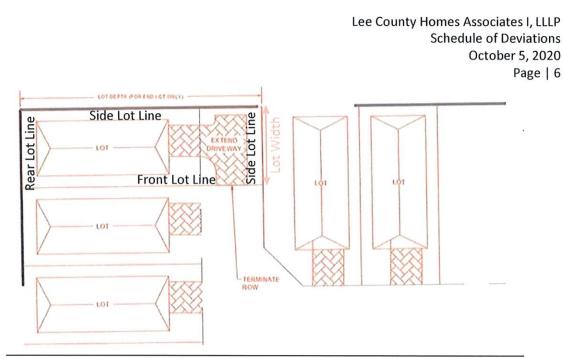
Graphic Example of Lot Layout and Dead End Street.
